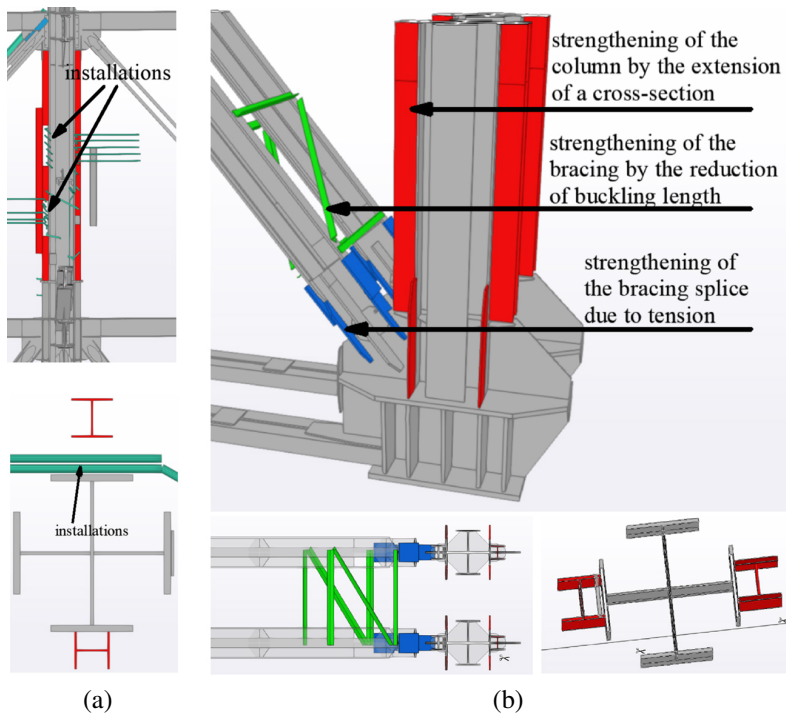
Reinforcement of the boiler room structure: a) reinforcement of the column omitting the electrical wiring, b) examples of reinforcement
